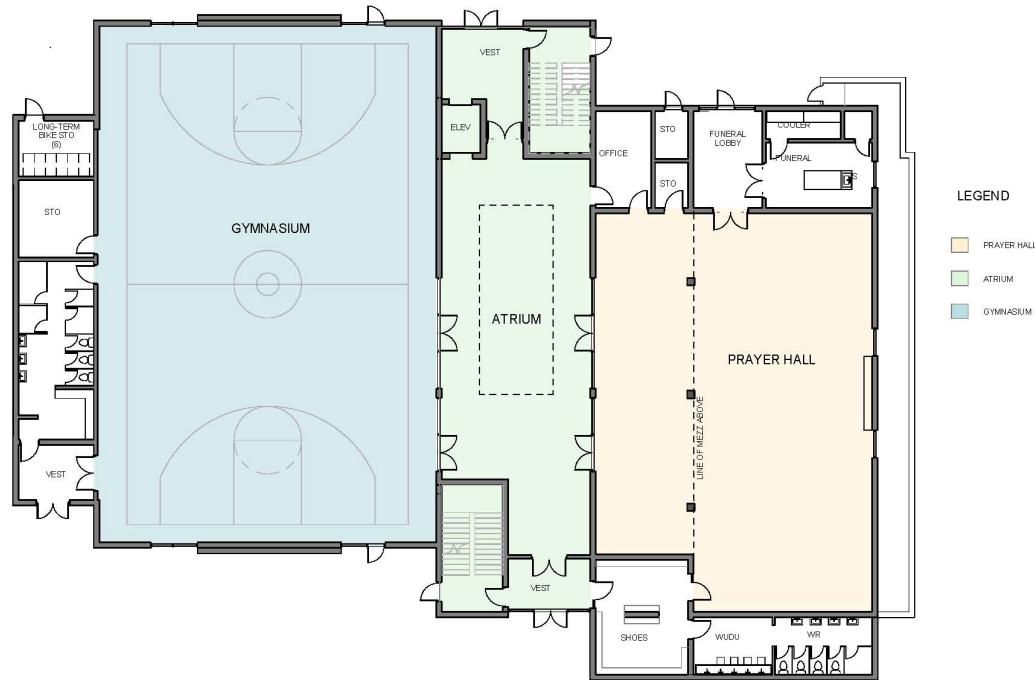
Ground Floor of the PCC Building Showing Main Functions
